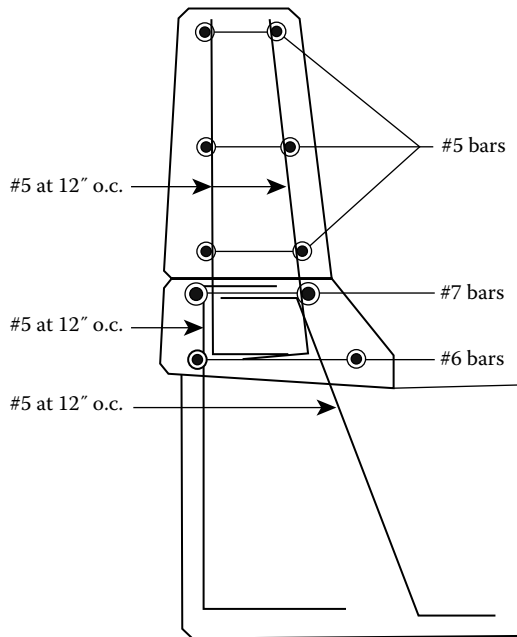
Barrier reinforcement. (Adapted from Achneider, E.F. and Bhide, S., *LRFD of Cast-in-Place Concrete Bridges*, Portland Cement Association, Chicago, IL, 2004.)
